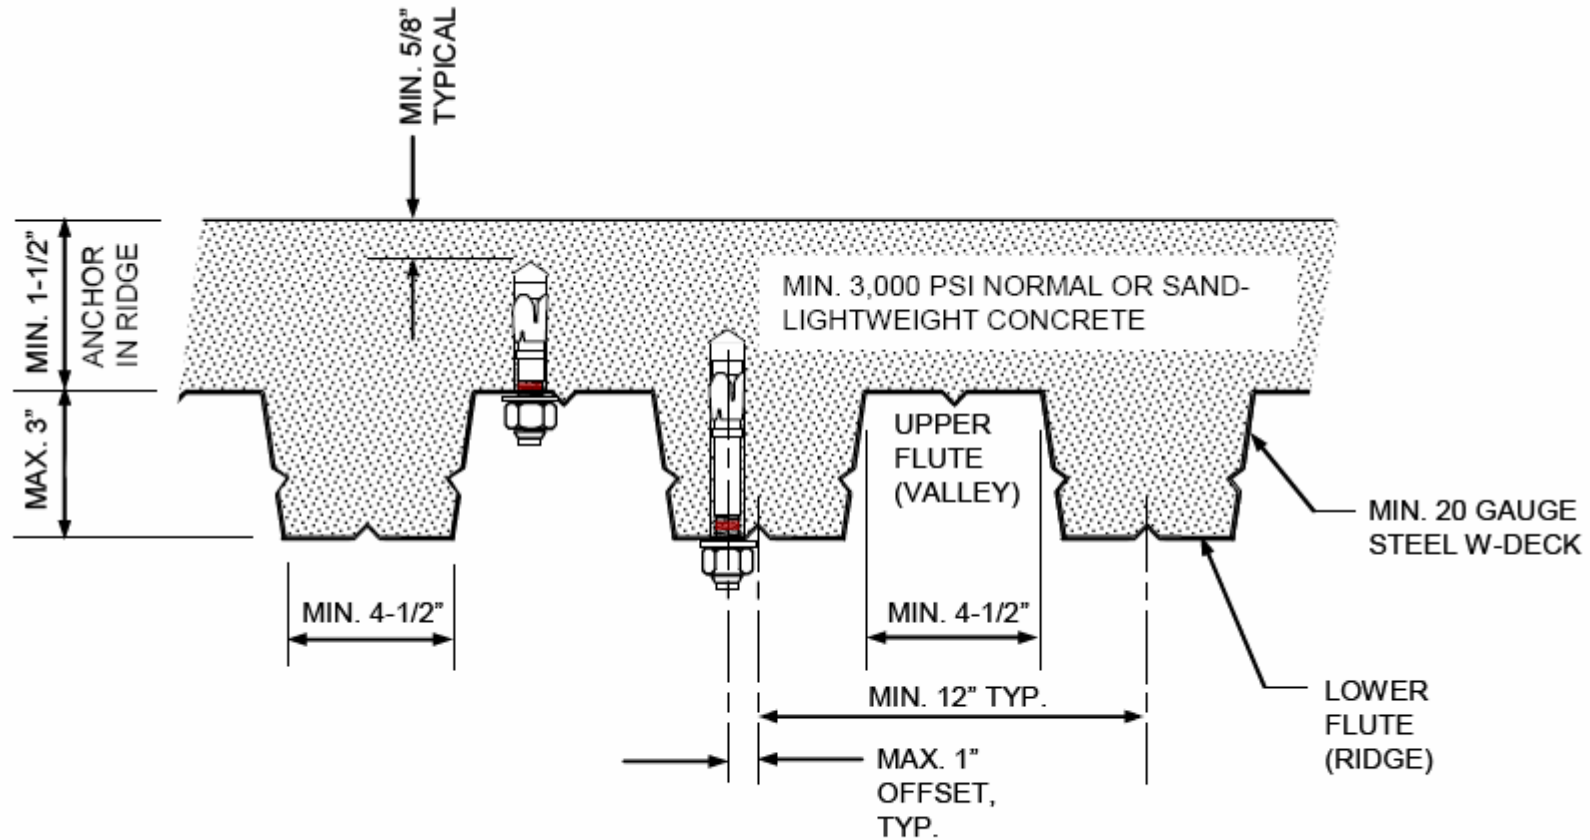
INSTALLATION IN THE SOFFIT OF CONCRETE OVER METAL DECK FLOOR AND ROOF ASSEMBLIES
